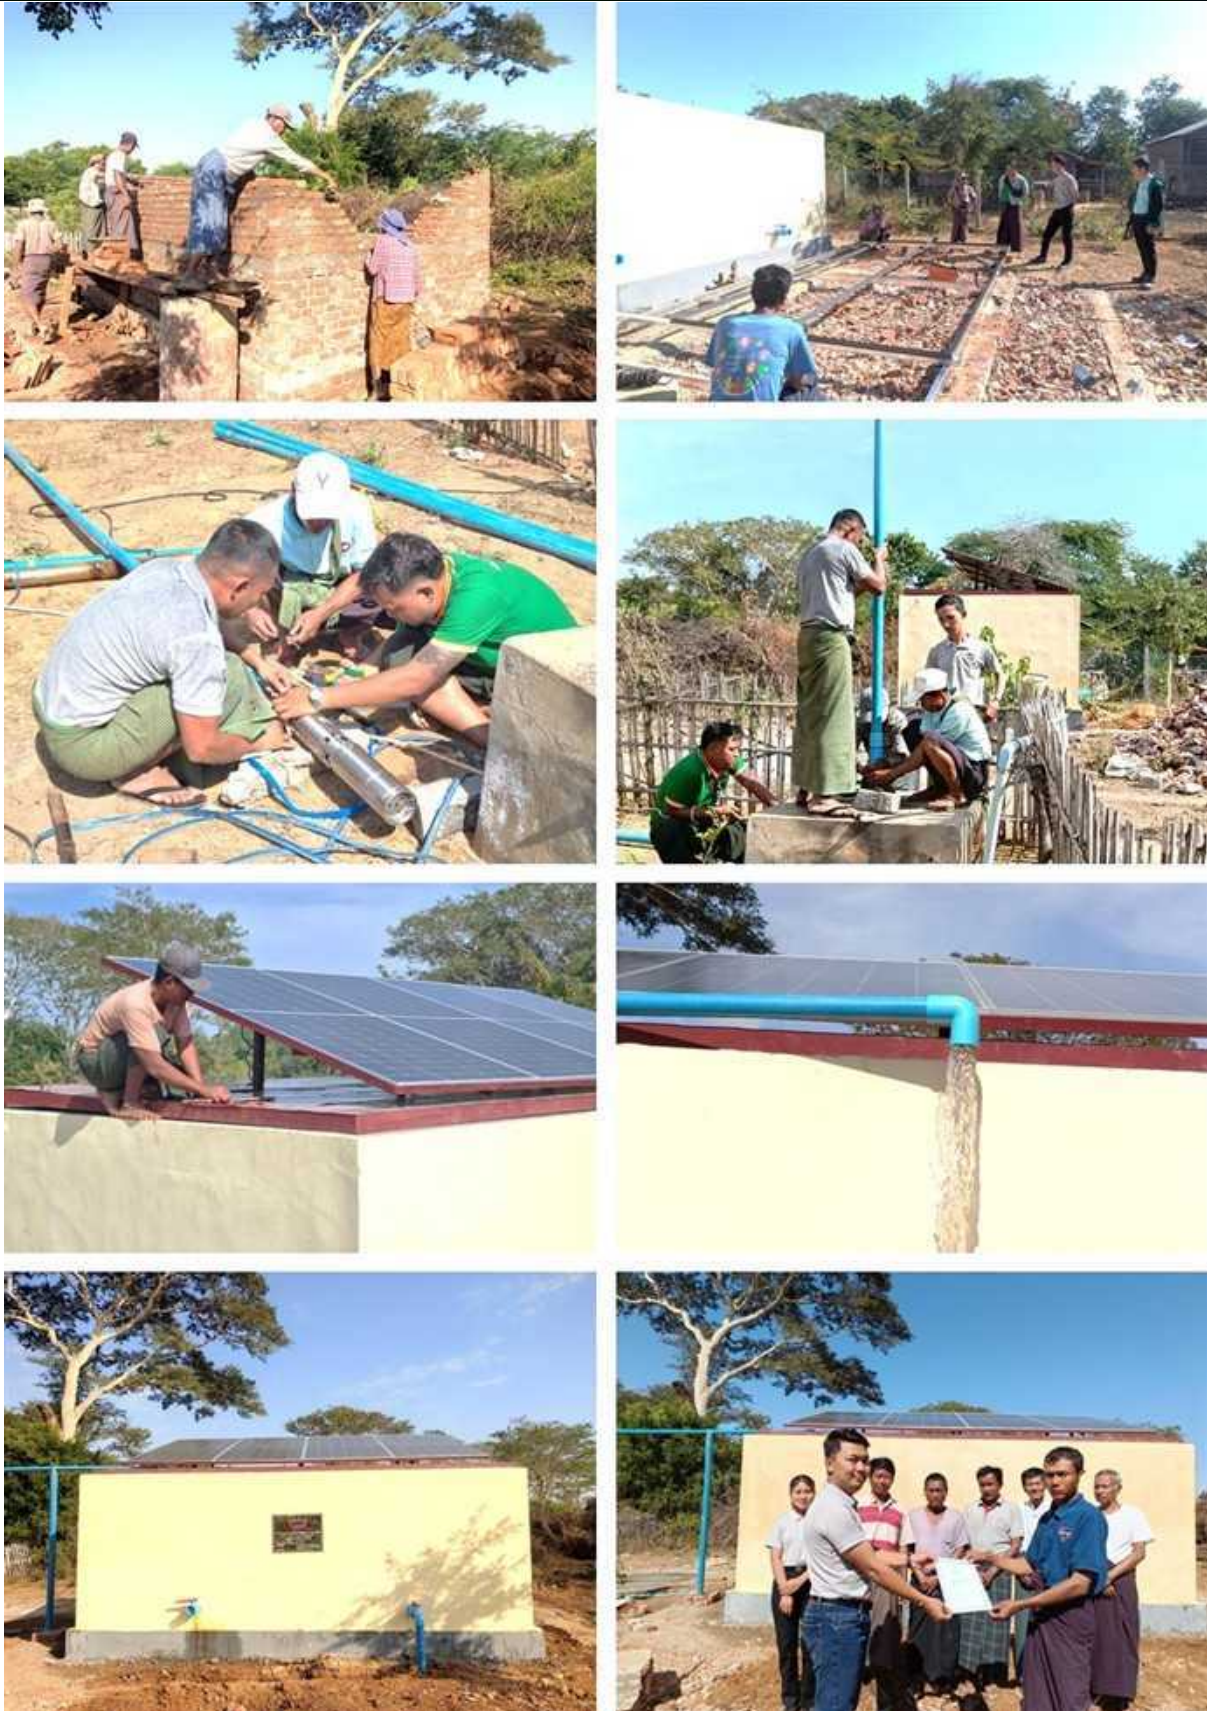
Completing Concrete Water Tank Construction and Solar-Powered Water Pumping System in Let Pan Ta Pin Village
